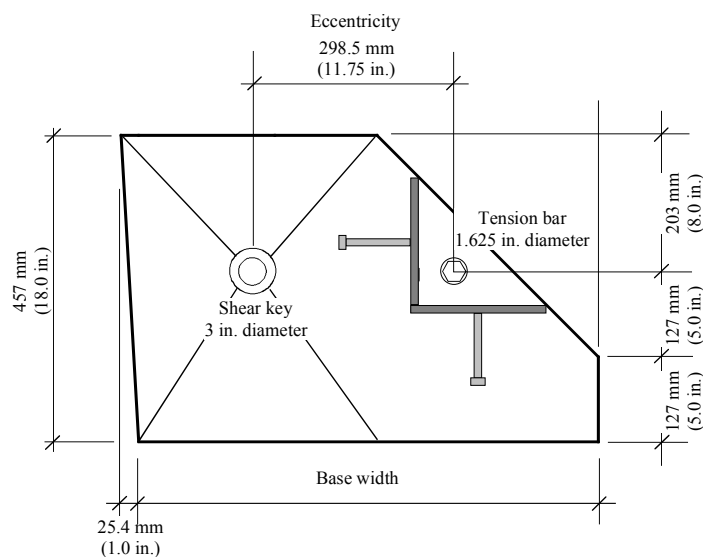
Cross-section of Florida Low-Profile Safety Barrier
